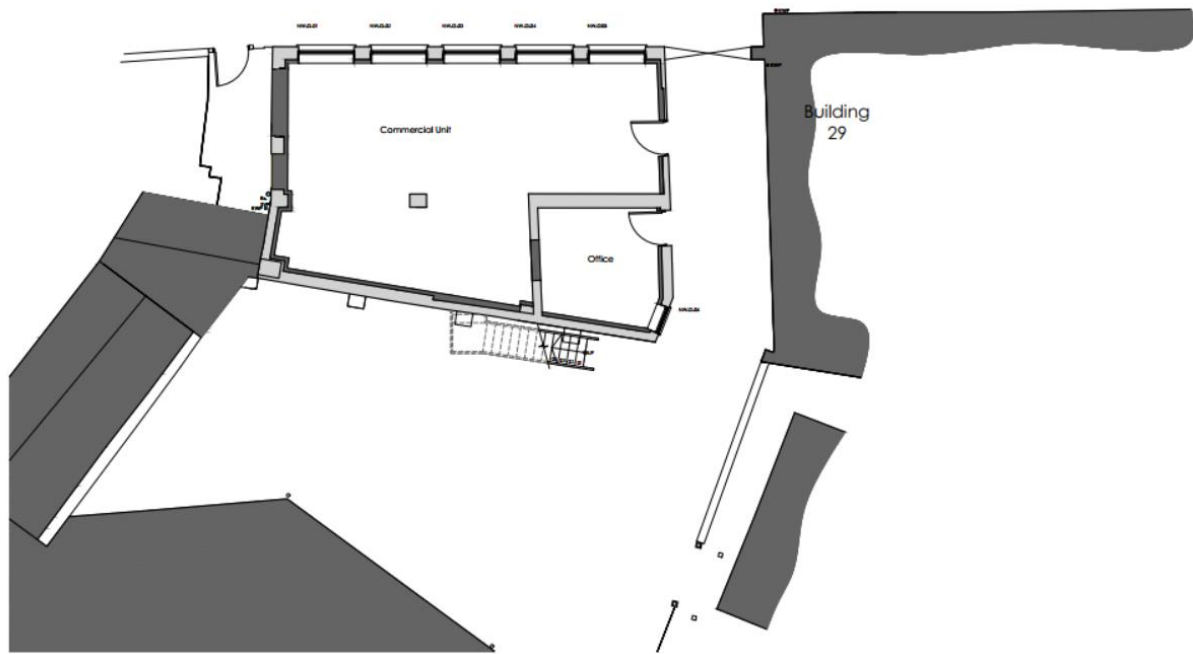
Proposed Ground Floor Plan - Showing Stair Location
